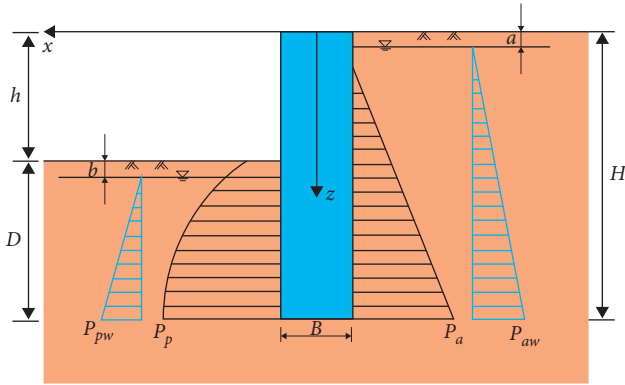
Schematic diagram of side pressure calculation of retaining wall.
